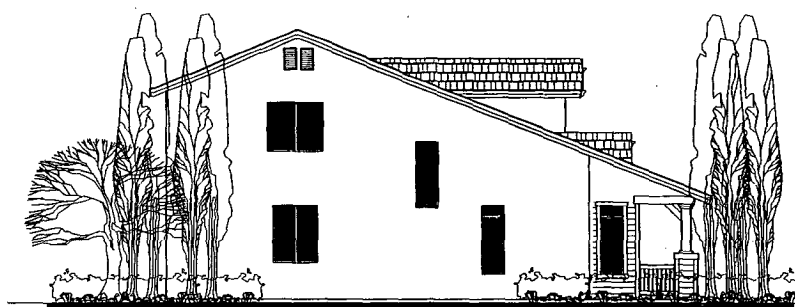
N - Plan 2 - Elevations and Floor Plans
